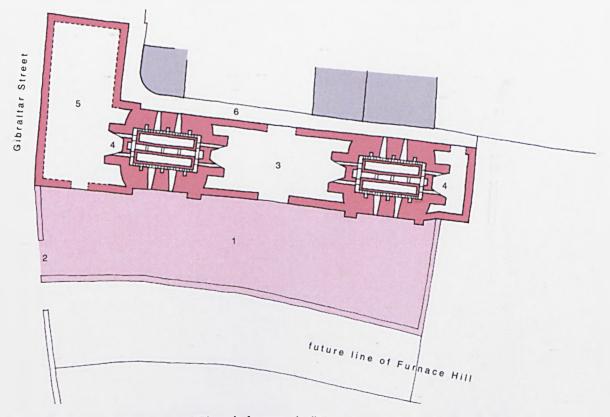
Hypothetical plan of Shore's furnace building, based on fig. 2.9 with furnace dimensions taken from Derwentcote, above. Scale 1:300 (author).
